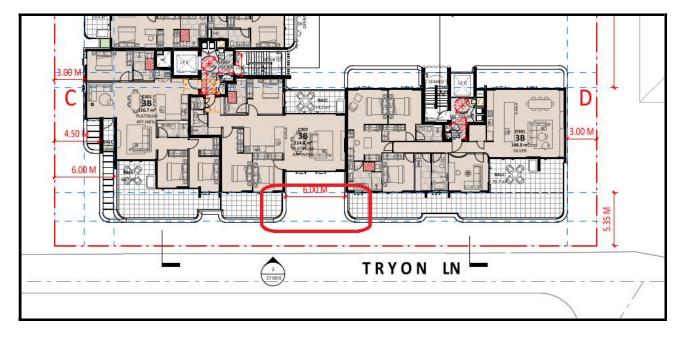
inadequate privacy measures between adjoining balconies of Buildings C and D (plan view)
